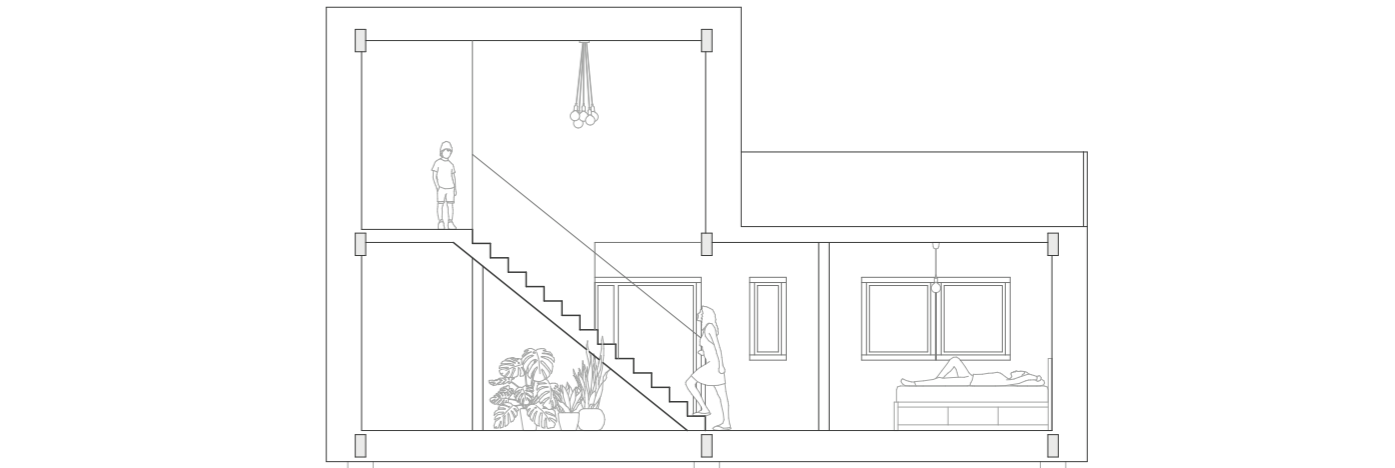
Drawing, Cross-section - Six persons house - 1:100. ©Personal illustration.
